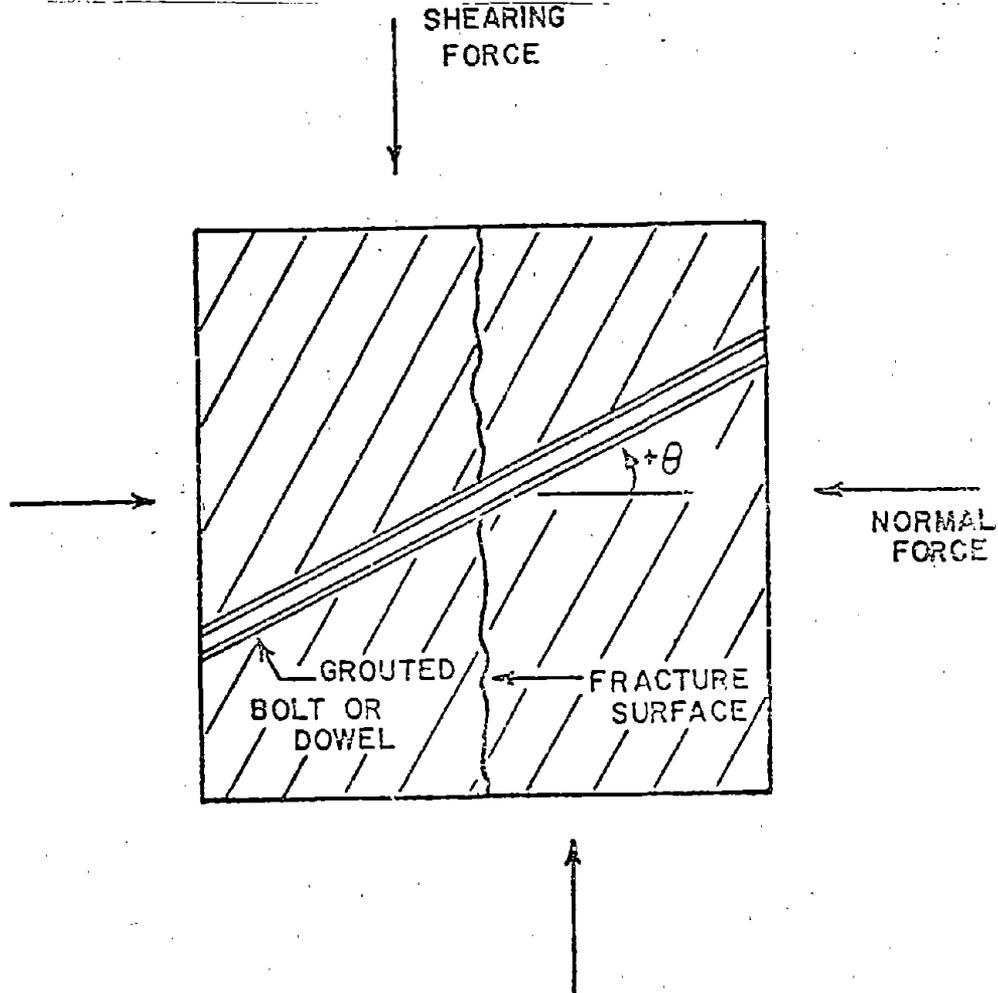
Schematic Sketch of Loading Geometry Showing Section of Rock, Fracture Surface, and Grouted Bolt. [2.41]
